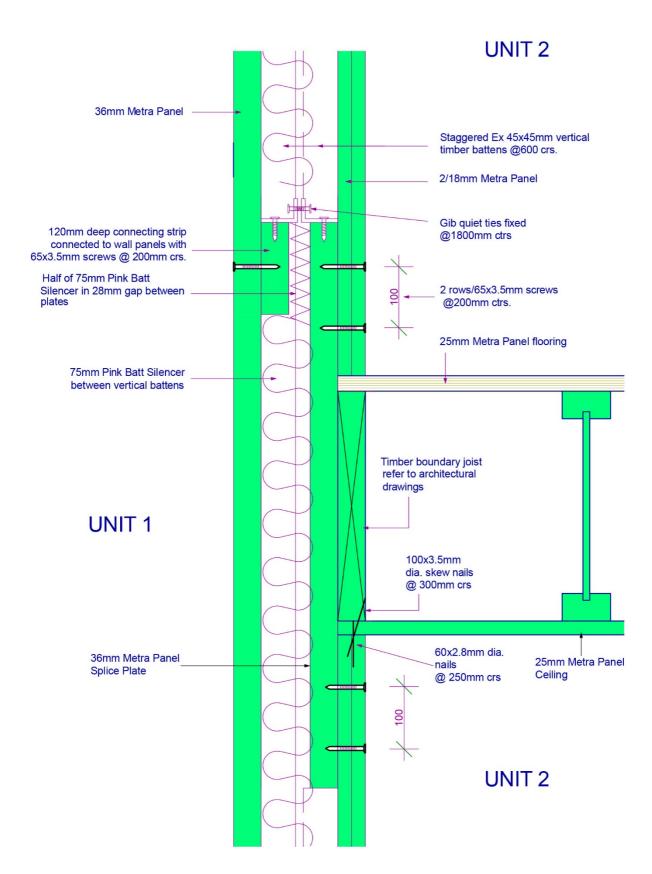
172mm/STC61 IT wall midfloor/single horizontal cleat
